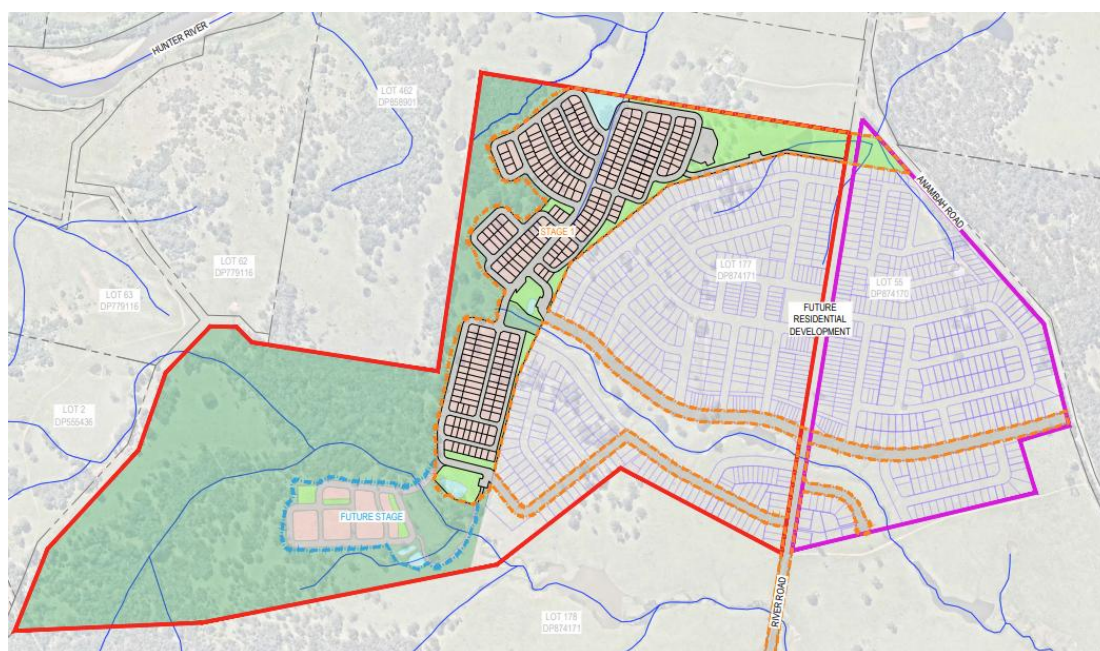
Site plan of proposed MHE development – DA/2025/52 (Concept and Stage 1).
